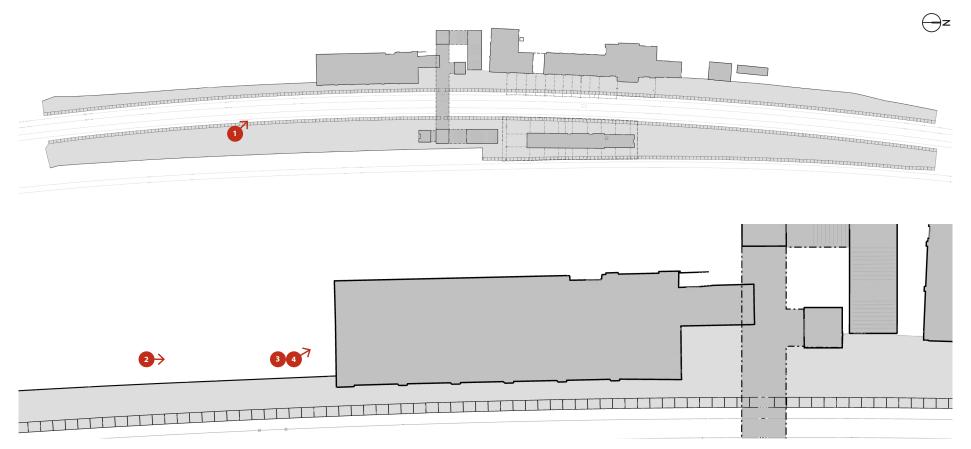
Key plan showing location and direction of photos of the exterior south elevation of the Good Shed
